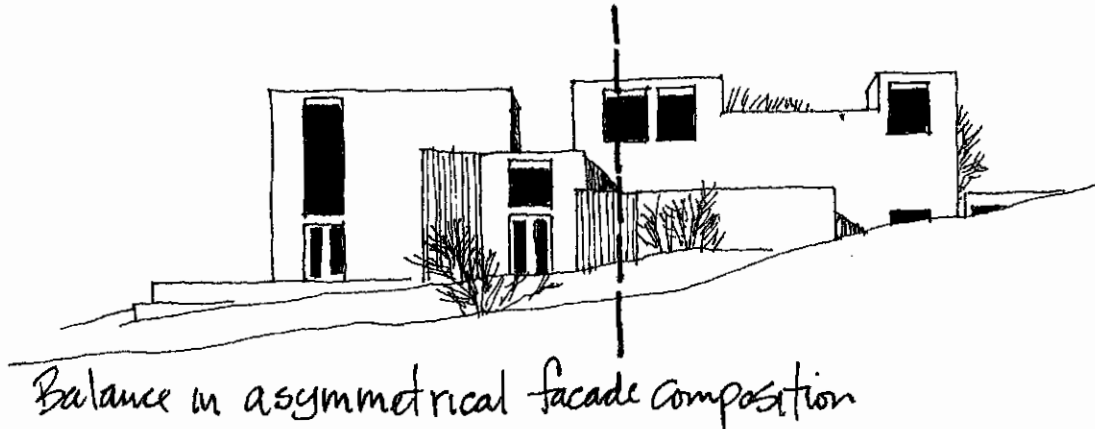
White Residence, Mitchel/Giurgola, architects.
